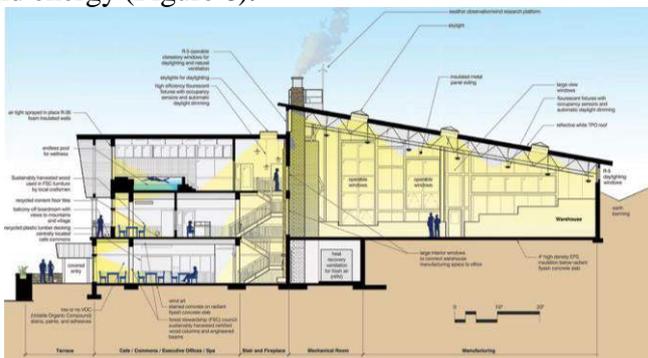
Building Cross Section Showing Skylights. (William Maclay Architects & Planners, 2008).
